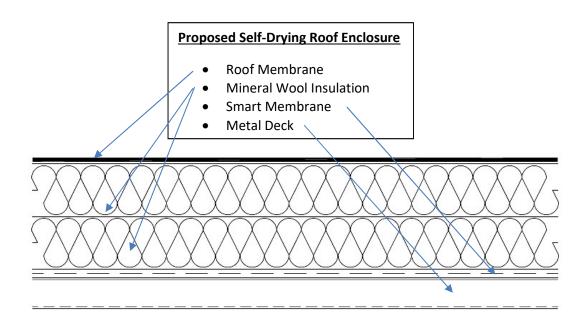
Section Through Proposed and Modeled Self-Drying Roof Enclosure
